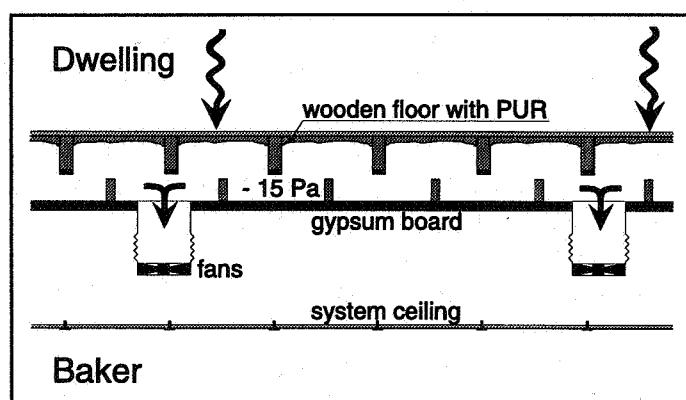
The Air Lock Floor principle in the floor between a bakery and a dwelling above avoids spread of smell.
